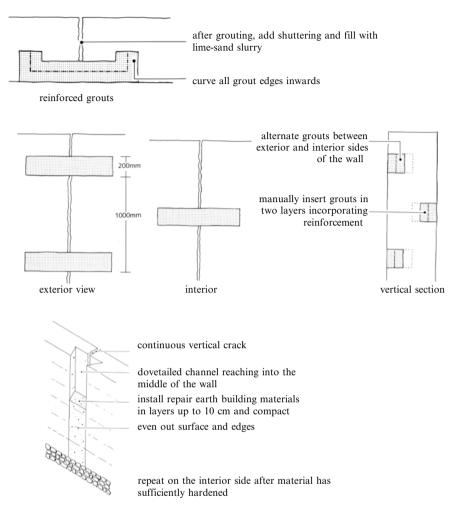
Repair of rammed earth and cob walls: crack repair using grouts made of lime-stabilized rammed earth and lime-sand slurry [71]
